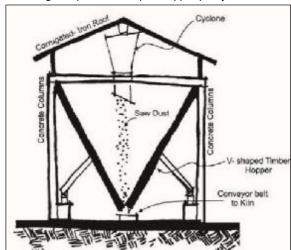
Cross- section of the Boiler room showing the cyclone, extracting sawdust from the factory floor, feeding it into the Boiler room via a Hopper in order to generate steam to be used in the timber kilns.
